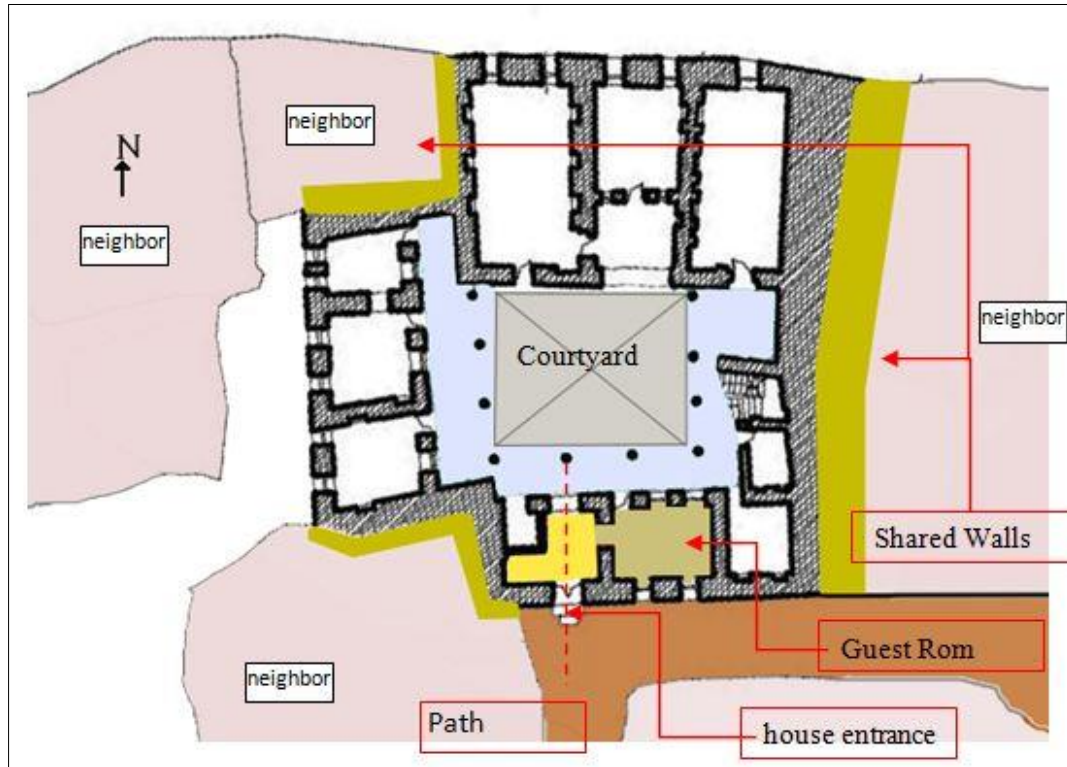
This house plan shows a direct entrance, adjacent guest area, details by author
